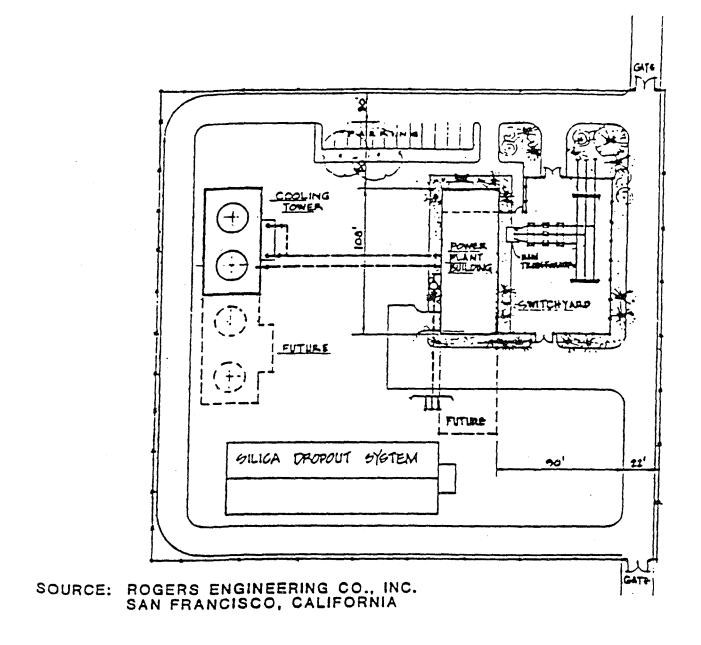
Site Plan - Initial 12.5 MWe Power Plant. (With Expansion to 25 MWe)
